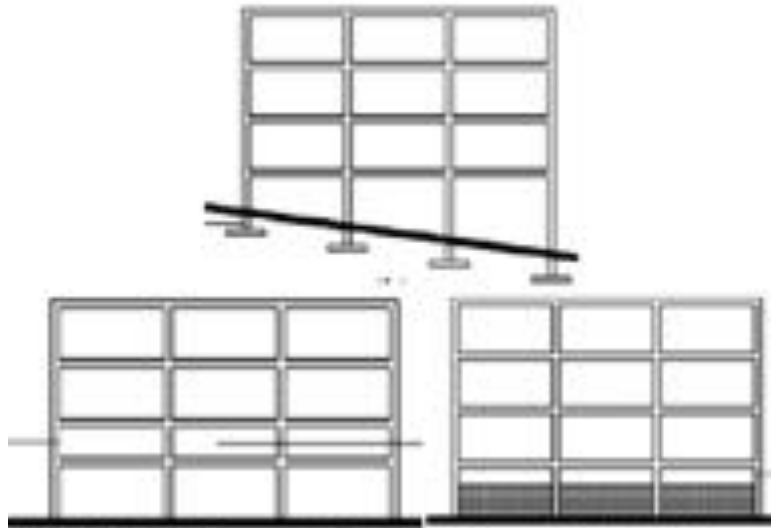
A short column on a sloping site, Columns 'shortened' by beams, Columns 'shortened' by Masonry or concrete infill
